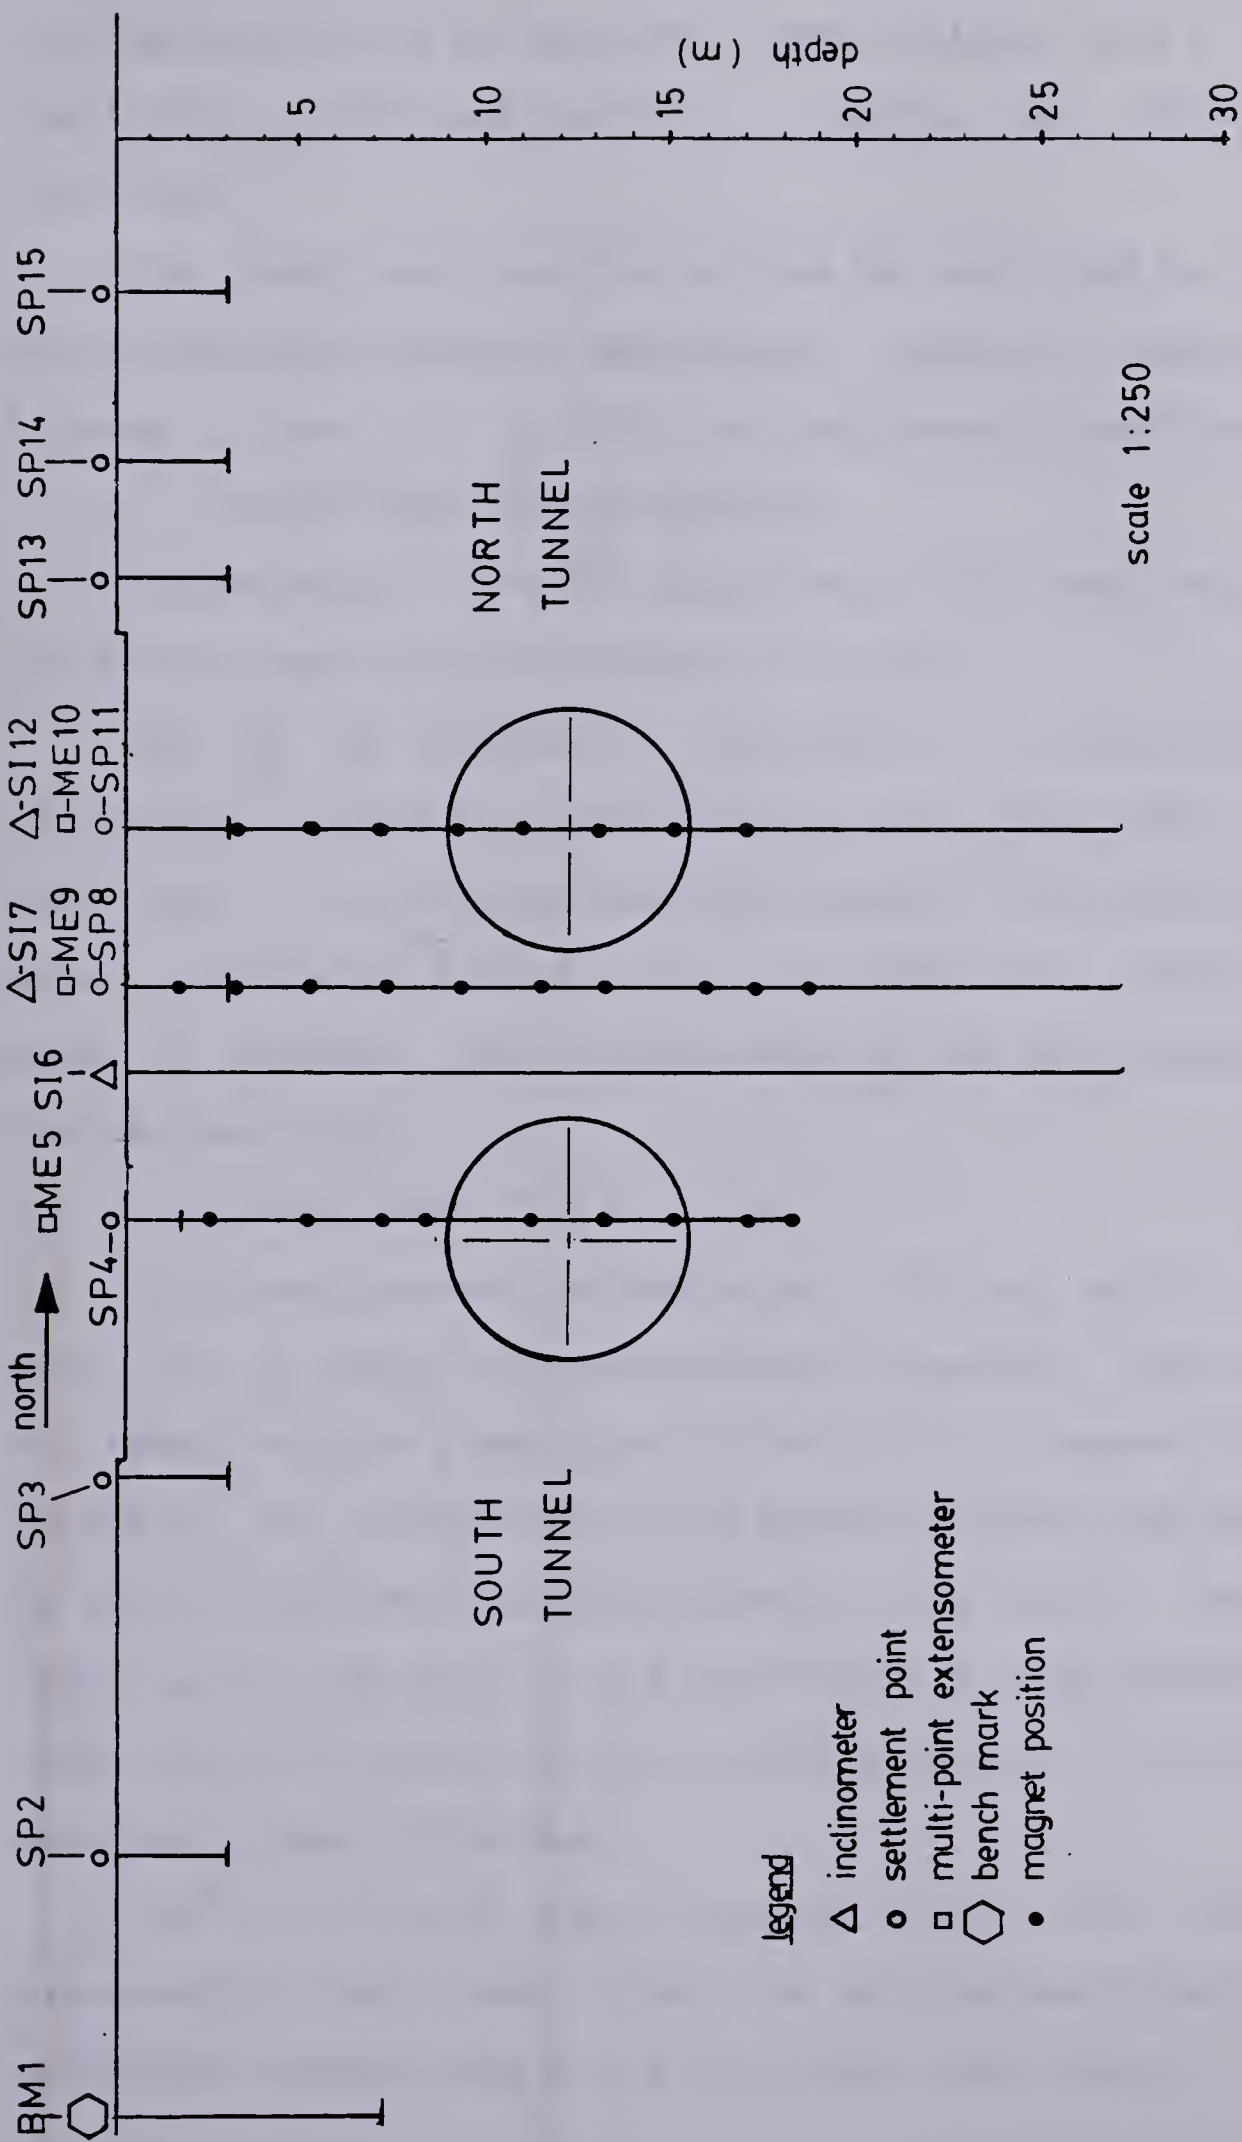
INSTRUMENTS LOCATION - TRANSVERSE SECTION
